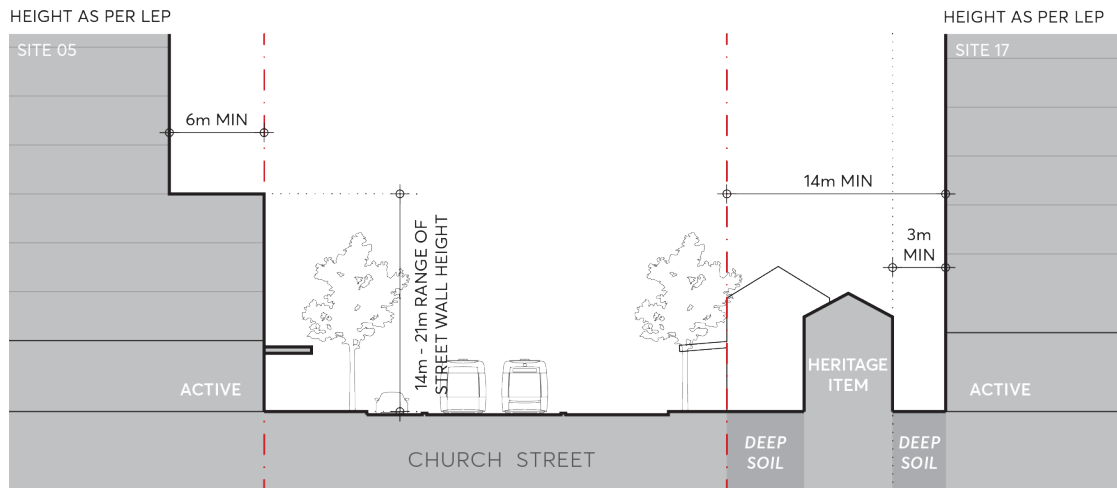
Site 17 (Section I) Setbacks and Street Wall Height
